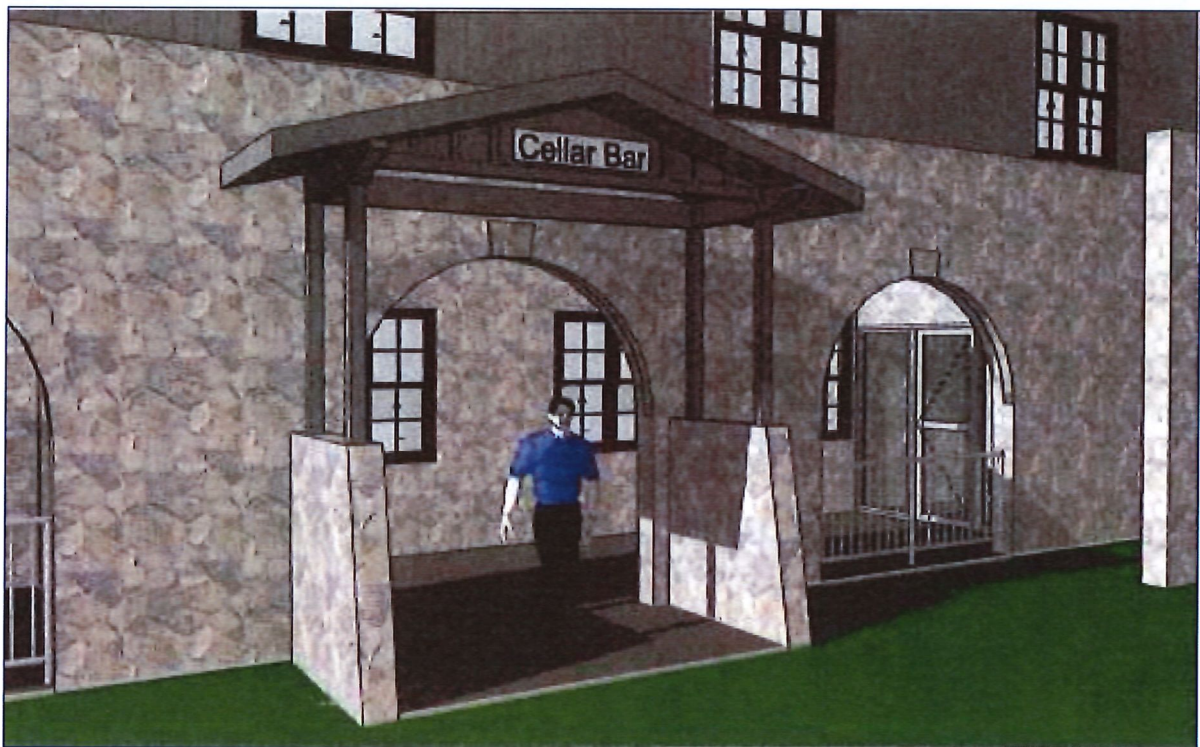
| Proposed portico structure (Source: Applicant's documentation)
